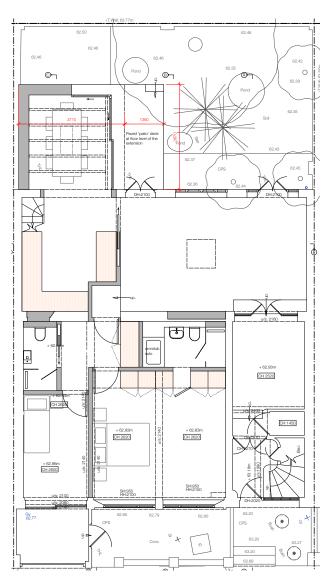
Proposed ground floor plan of no. 75 Belsize Lane.
